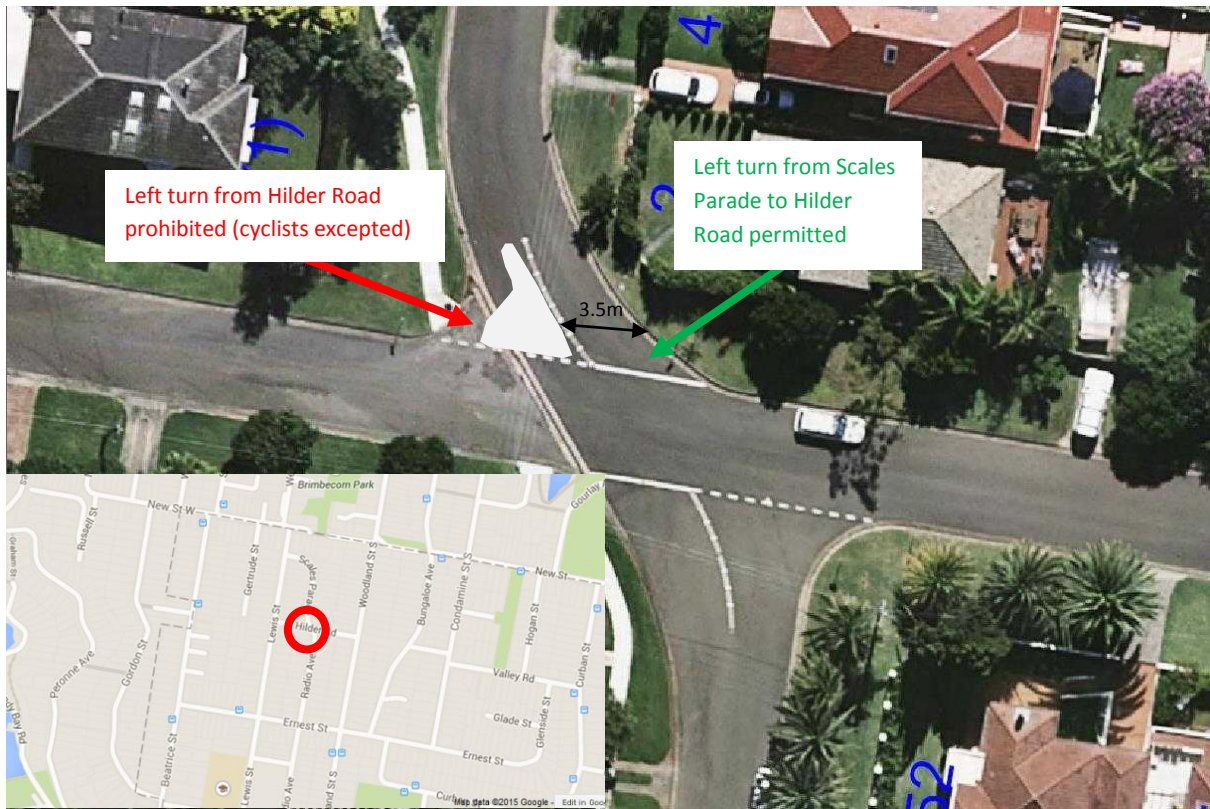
Proposed concept plan of traffic island on Scales Parade at the intersection with Hilder Road, Balgowlah Heights
